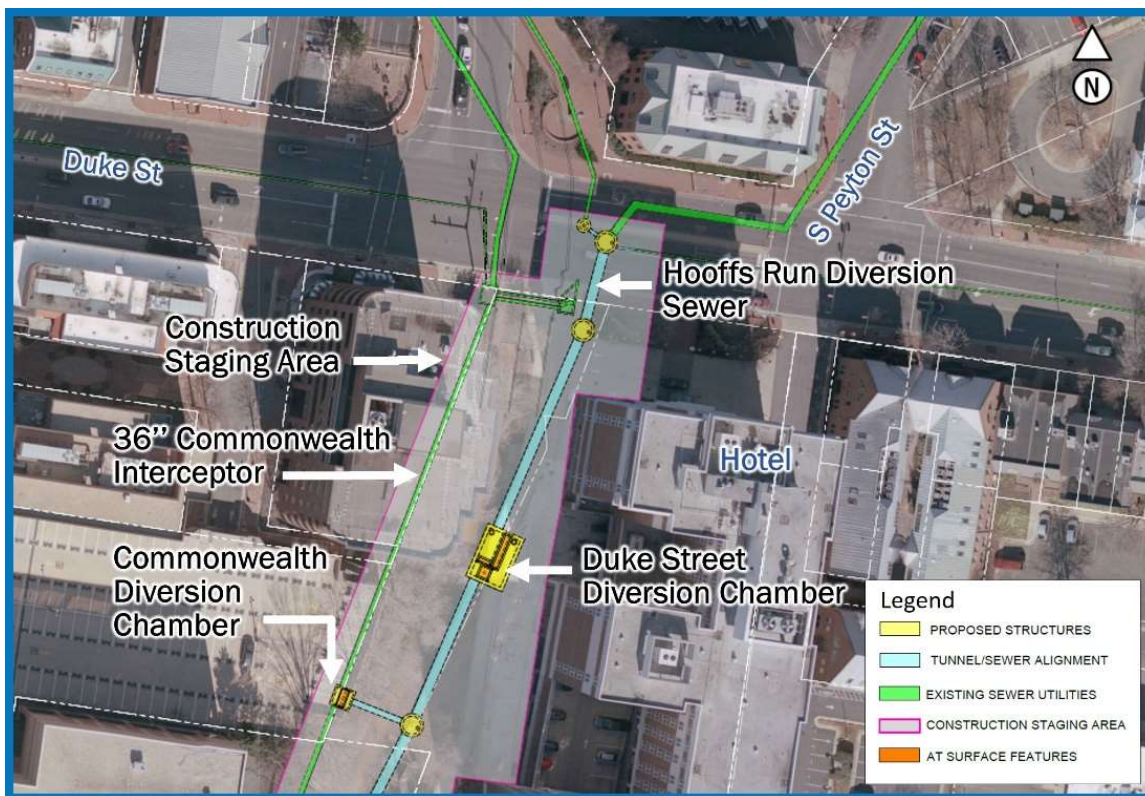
Hooffs Run Diversion Sewer and Structures near Duke Street
